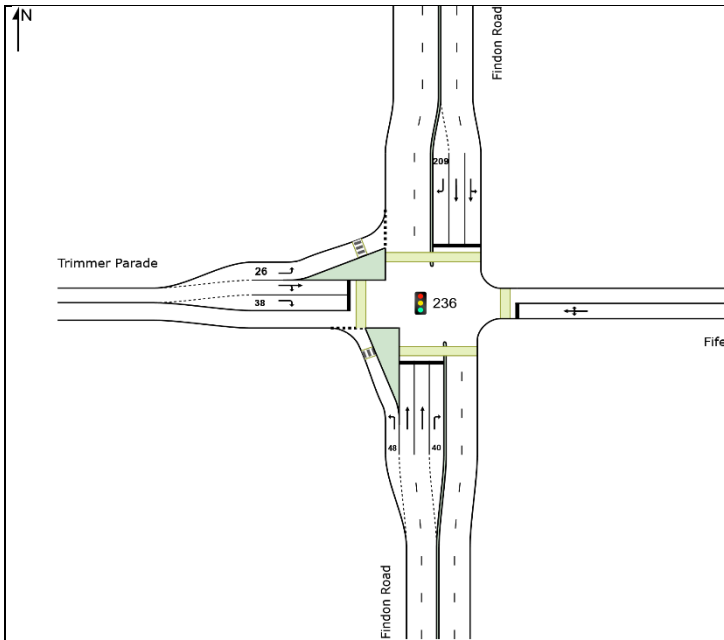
TS236 Findon Road – Trimmer Parade Site Layout
